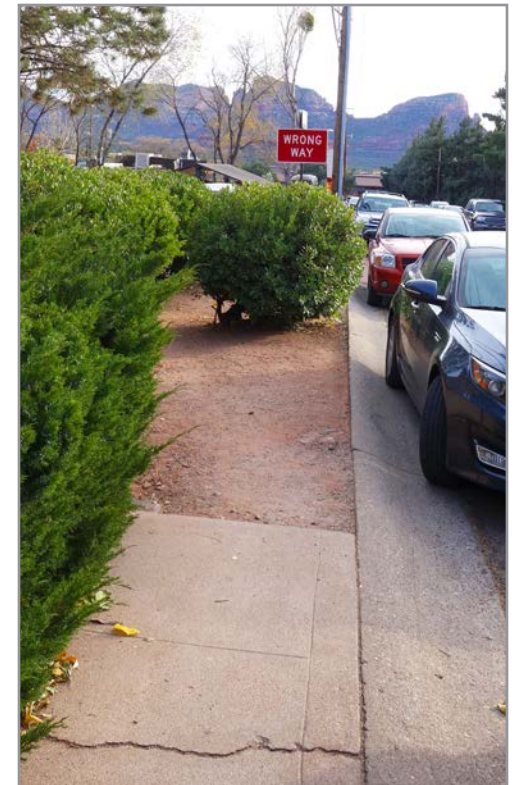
Pedestrian access to the Van Deren Rd public parking lot.
